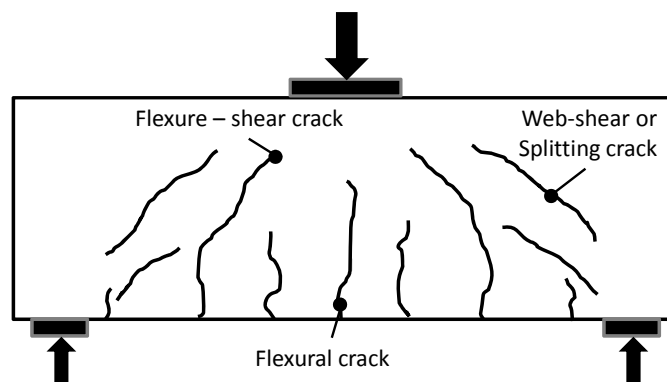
Types of cracks in reinforced concrete deep beams
